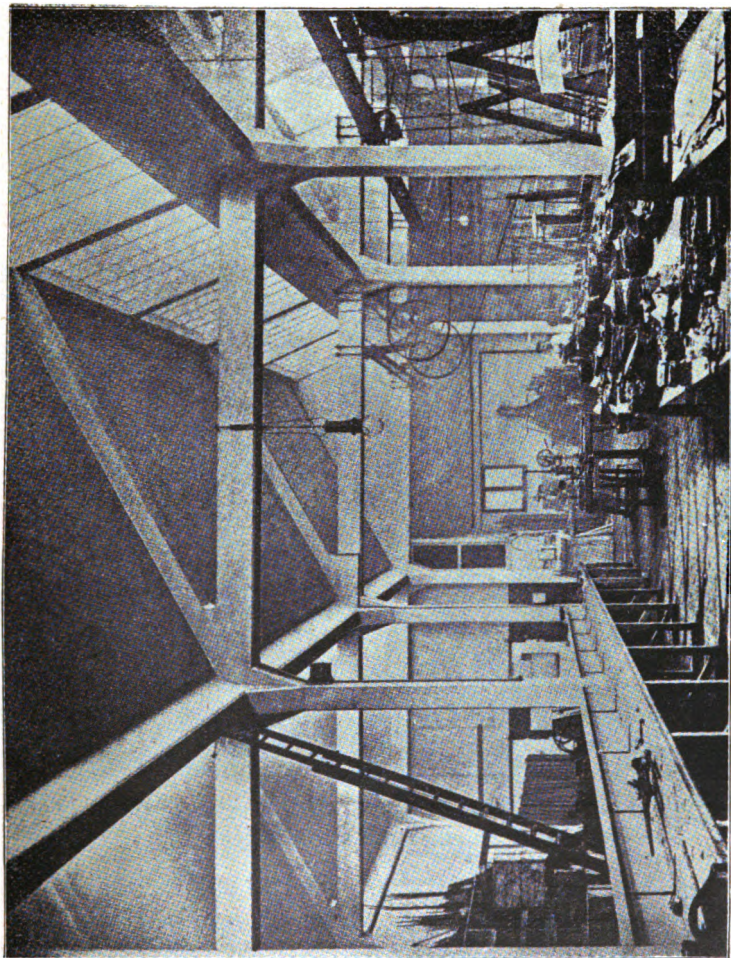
Shed Roof of Armored Concrete. Distance of Columns 20 feet.
